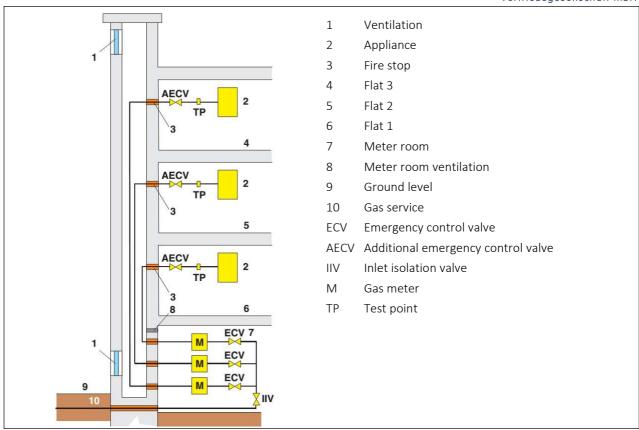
Elements of a typical installation in multi-storey buildings containing flats or maisonettes – installation via a ventilated duct
